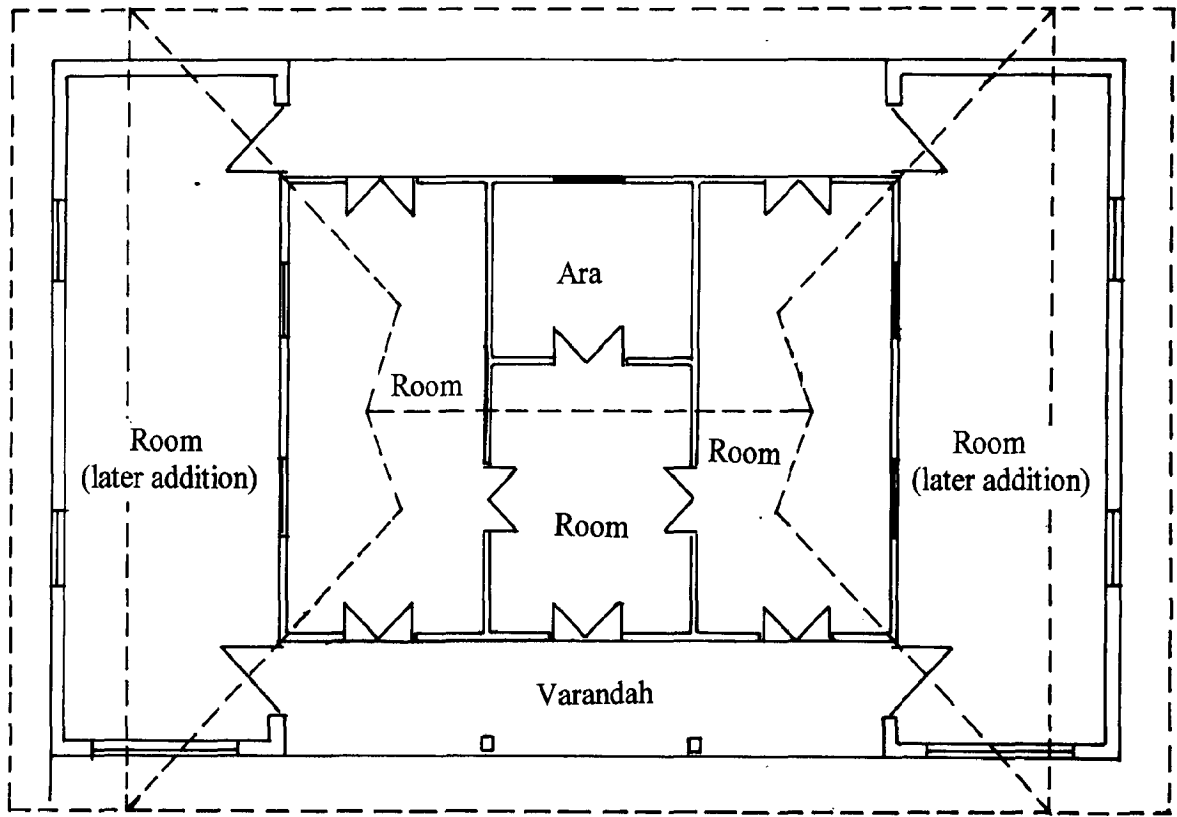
Plan: *Palamthattel* House, Scale 1:100
